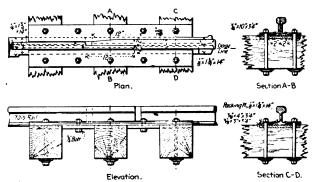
Expansion Rail Joint; Poughkeepsie Bridge.
